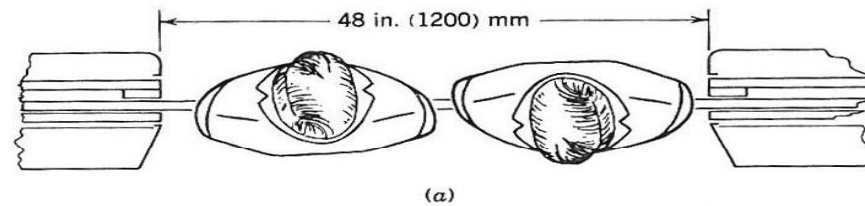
Nominal loading, 3500-lb (1600-kg) "stretcher-shaped" elevator.
